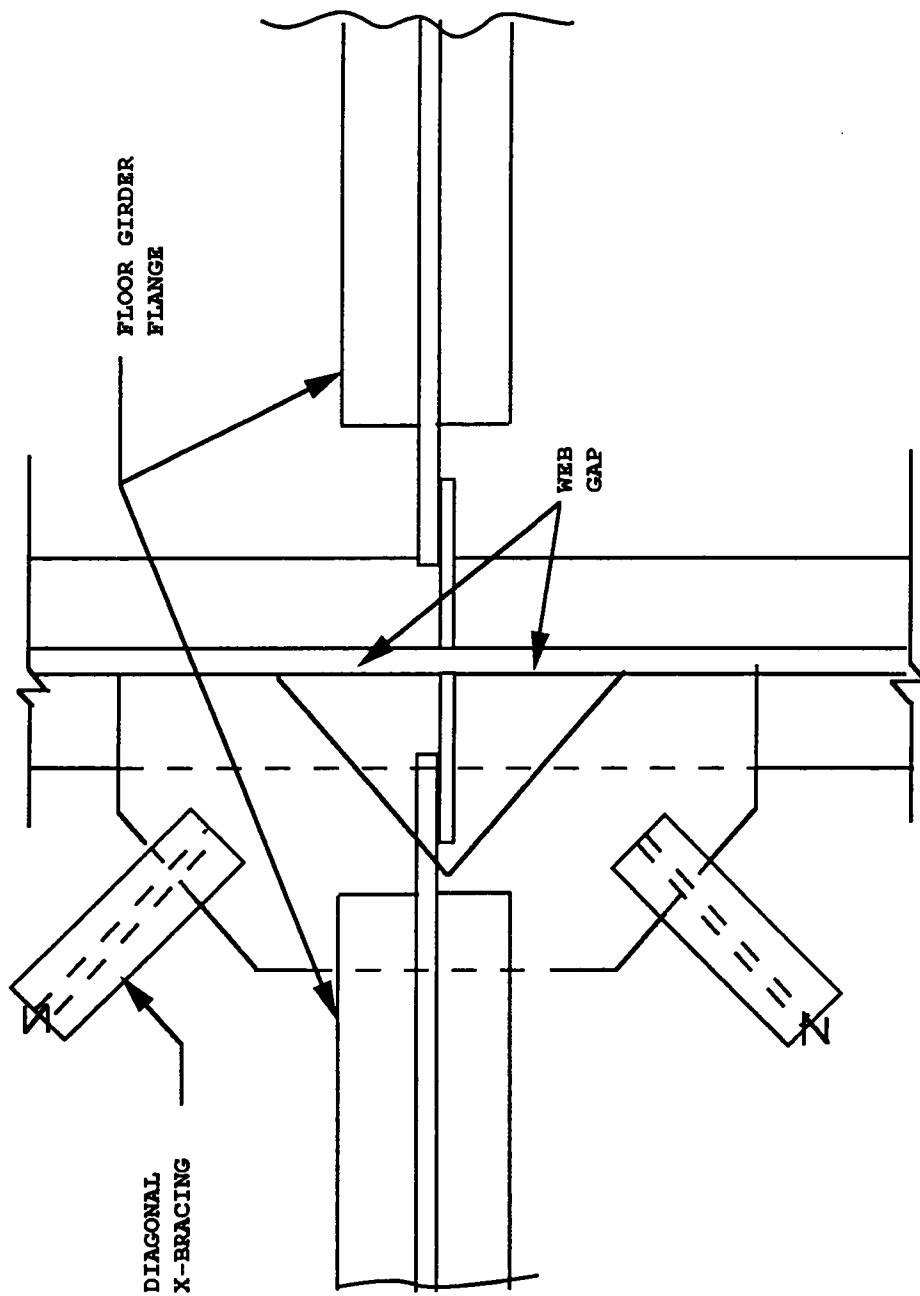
Web Gap at Floor Girder to Main Girder Connection
